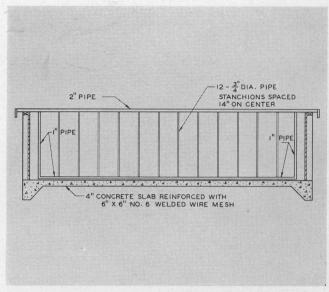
Construction details for stanchion-type gate. This type of gate also can be constructed of wood.
